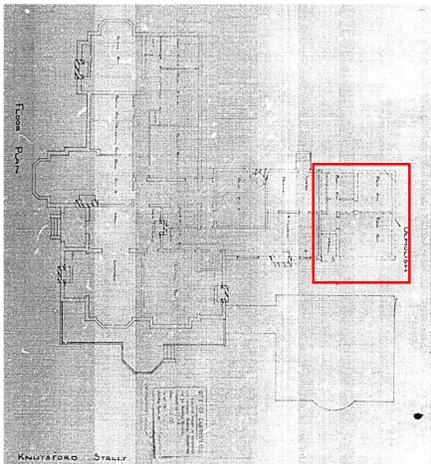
Extract from building permit plan showing rear section to be demolished (Source: BP 18165, held Boroondara City Council)
